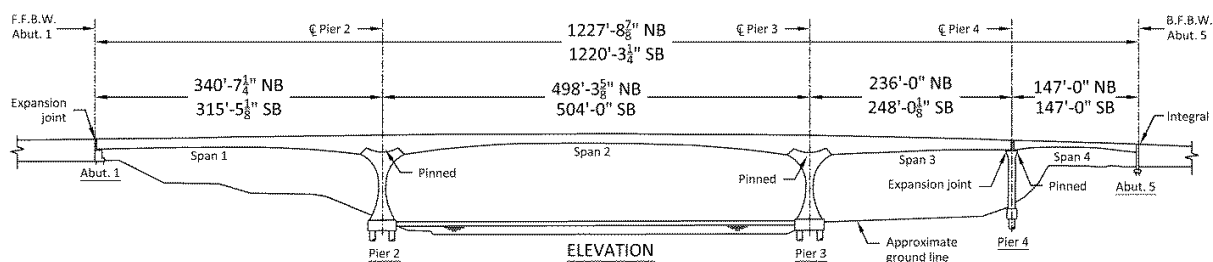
Elevation view of the I-35W Saint Anthony Falls Bridge (French et al. 2012)
